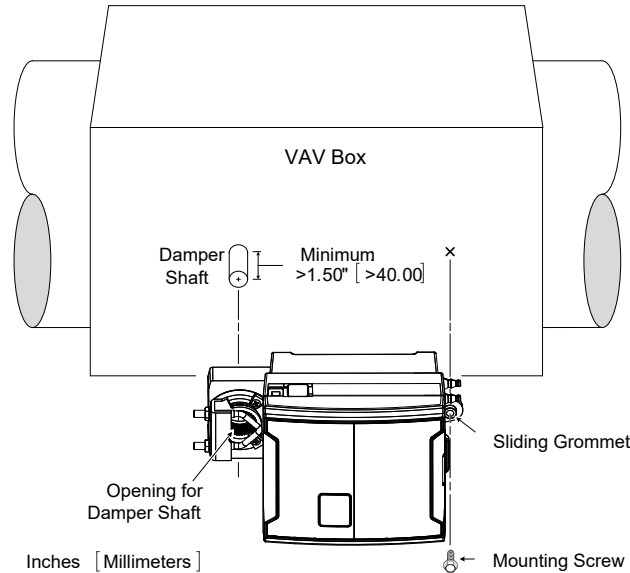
Standard Mounting Method: Mounting a controller on a damper shaft
